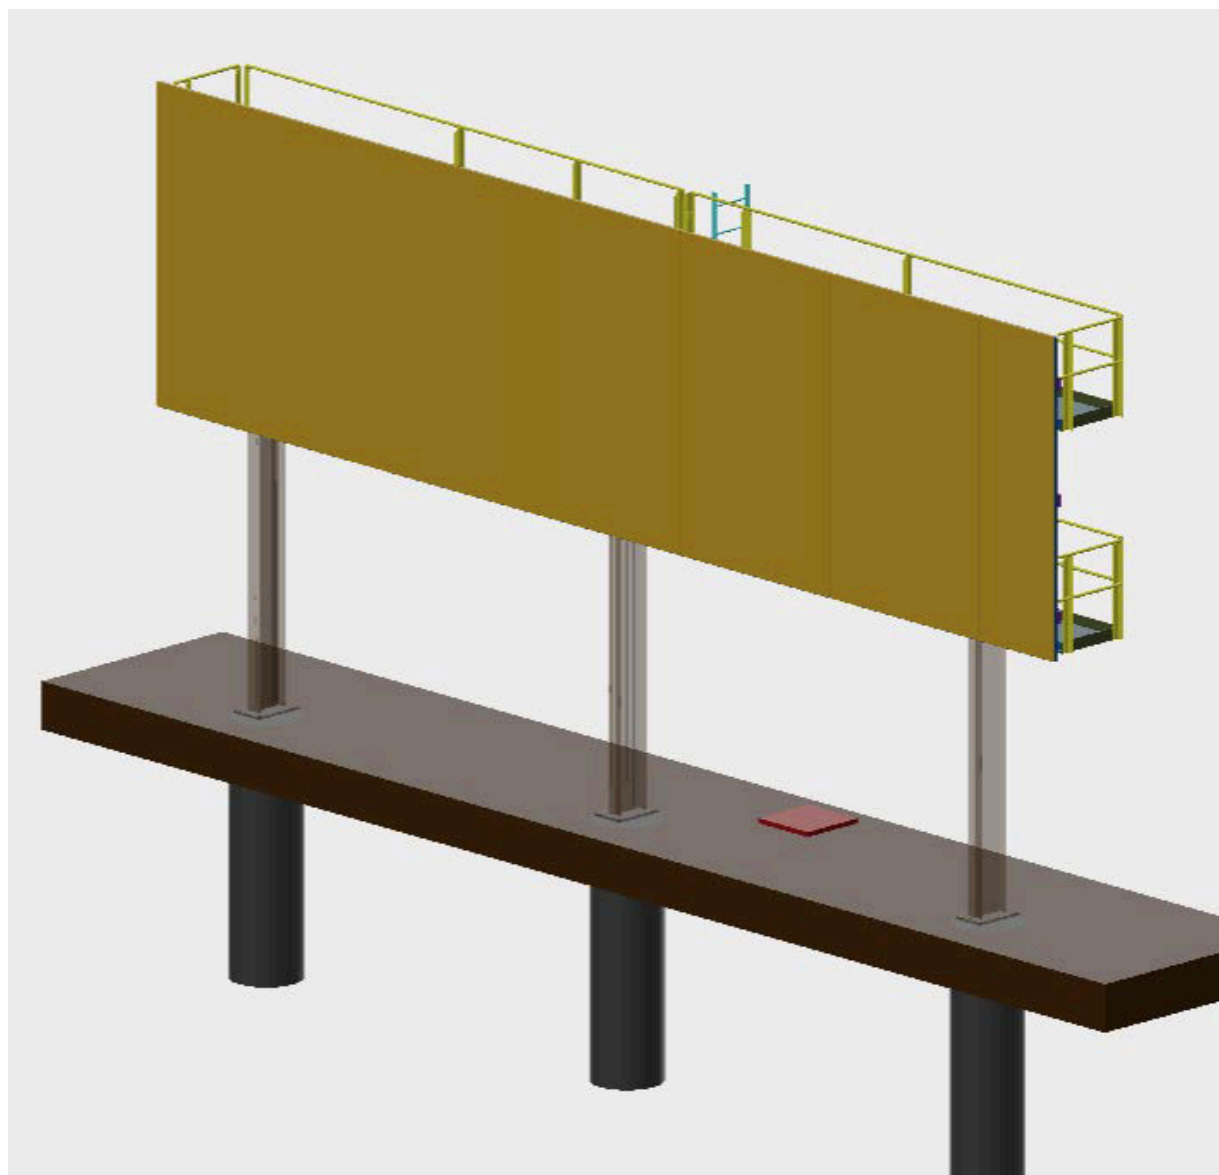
Proposed information sign (Source: Outdoor Fabrications)
